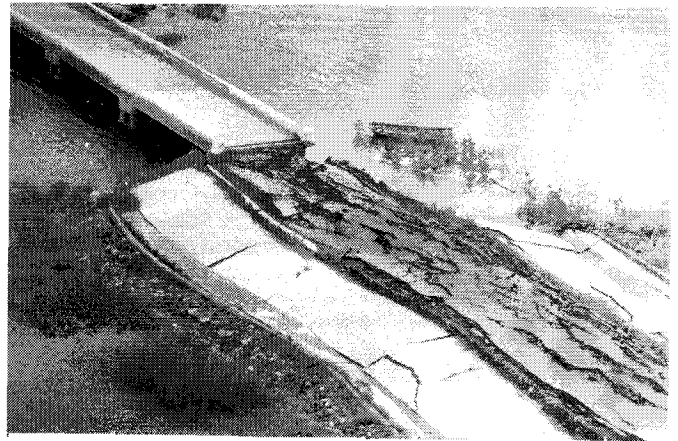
Bridge on undamaged pile foundations with failed embankment; Nihon-kai-chubu earthquake, 1983.
